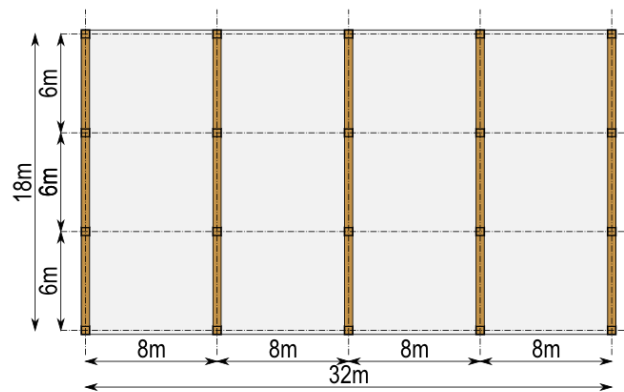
Sample building plan view with 5 seismic and gravity frames
